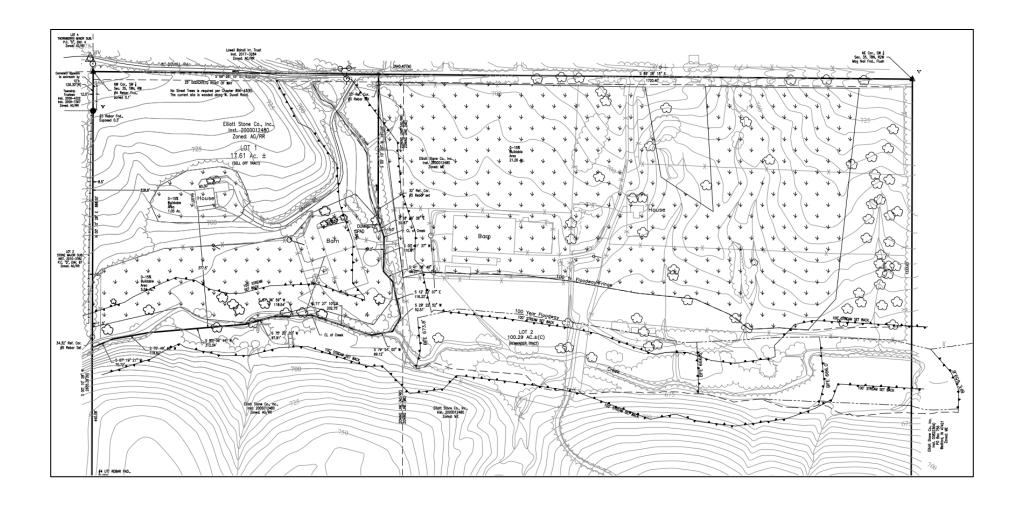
Elliott Stone Quarry on Rockport RD Site Plan
